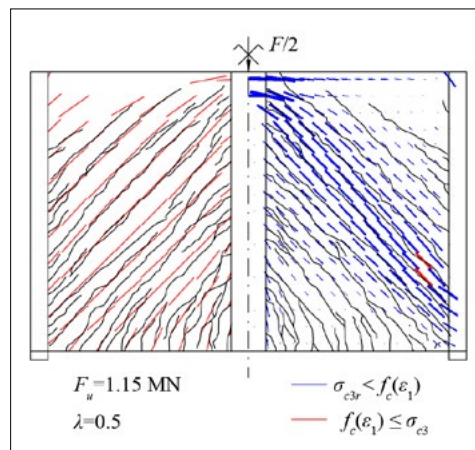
Recalculation of a plate test carried out by Leonhardt and Walther [17]: Crack pattern and principal concrete compressive stress in the main girder [15].
